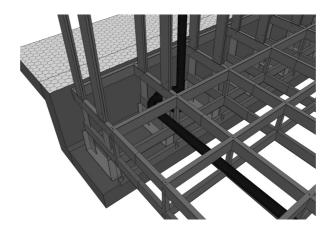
the foundation system will require special attention as not to damage the soil ground of each place. The structure is based in the foundation. The reinforcement is already precut and available to put it in the hollowness of the structure the pipes have enough place to move along their spaces. These pipes can ``appear'´ whenever they are required, by cutting the floor, partition or ceiling panel when it is needed.
